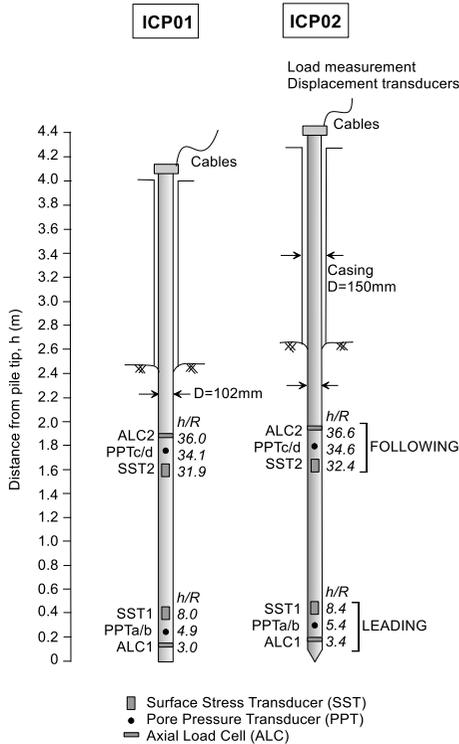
Imperial College Pile configuration used in chalk tests; [Buckley et al. \(2018b\)](#)
